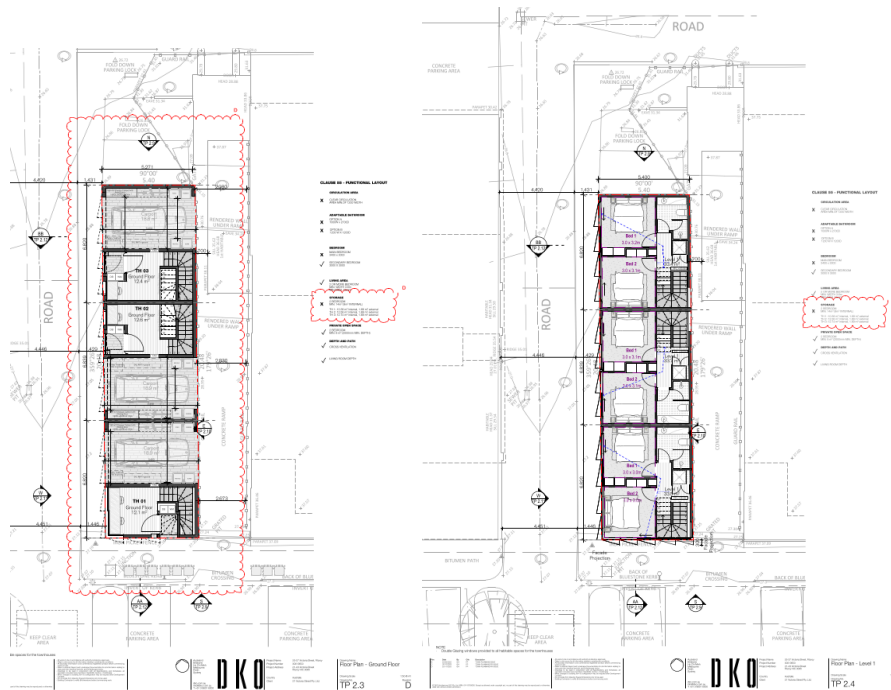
Proposed ground floor plan and first floor plan - 9 Victoria Street (Townhouses)
